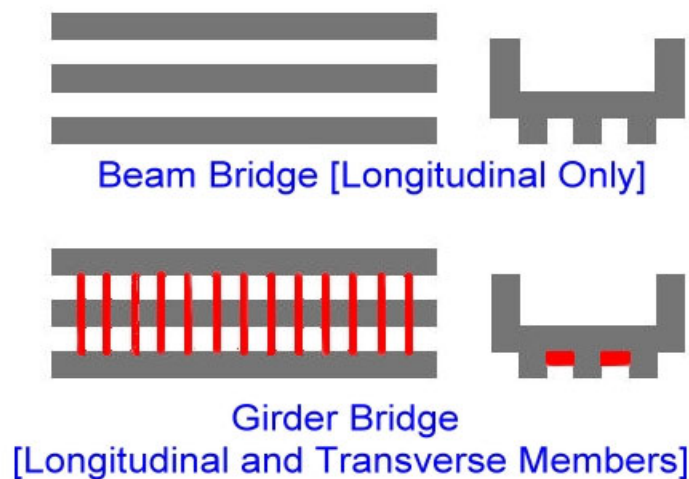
Beam and Girder Bridges, in Plan and Section
